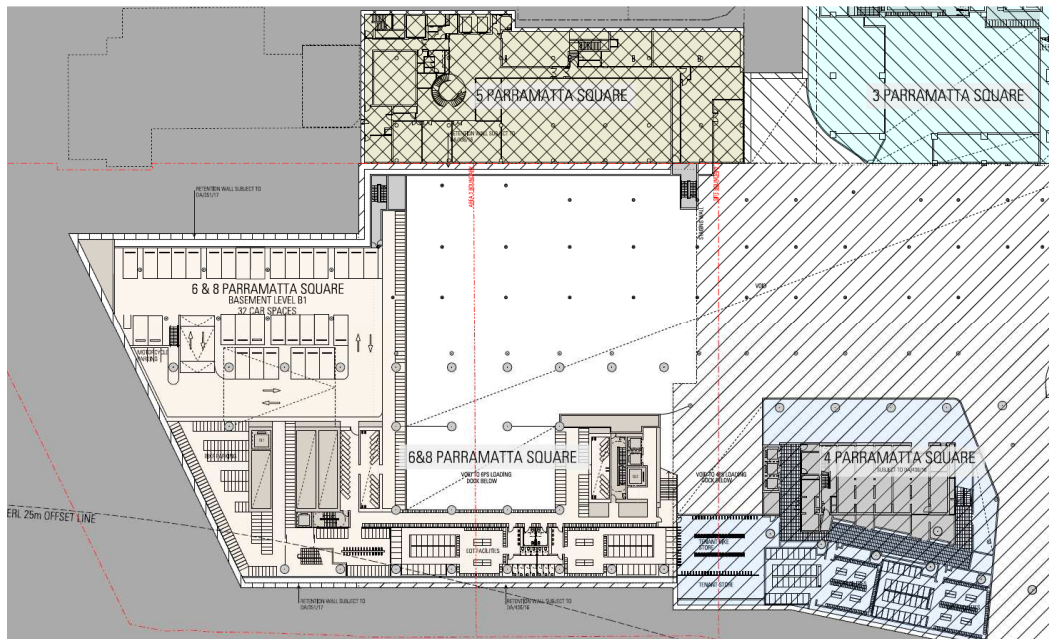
Basement Level 1 showing bicycle parking and end of trip facilities
